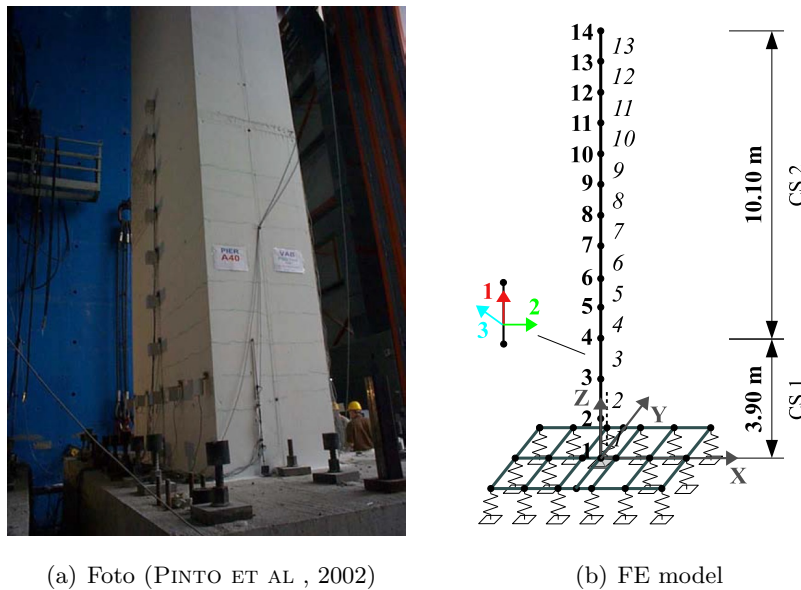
Pier A40 with foundation block (*ELSA*, test v22)
